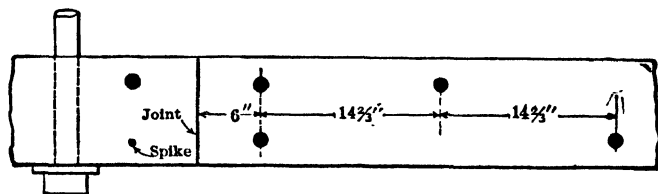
Elevation of Beam Opposite X of Fig. 25
